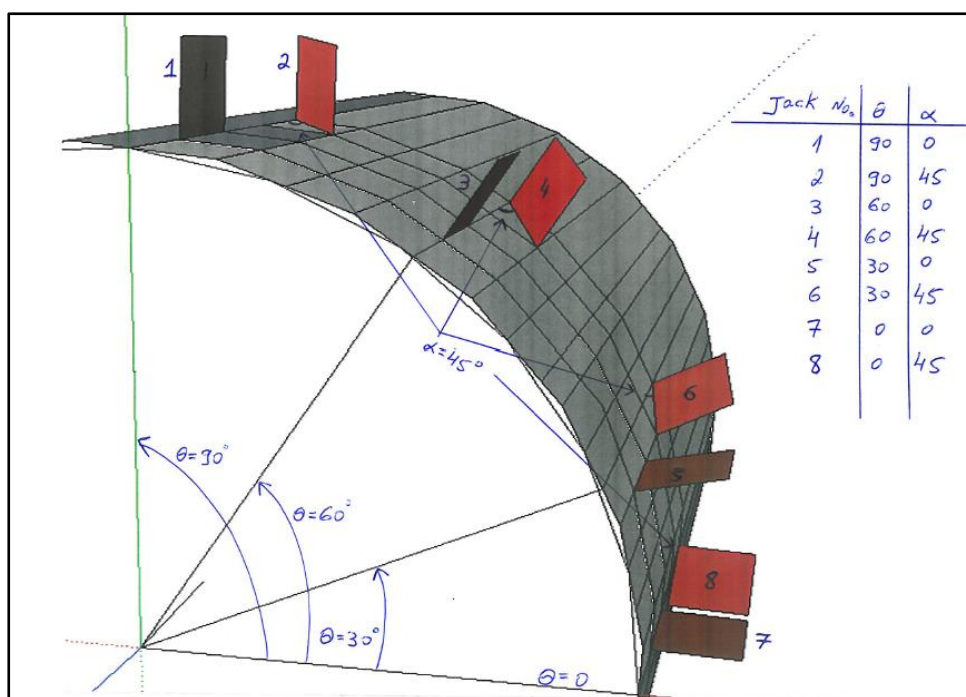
The suggested setting for installation of the flat jacks around the tunnel opening
